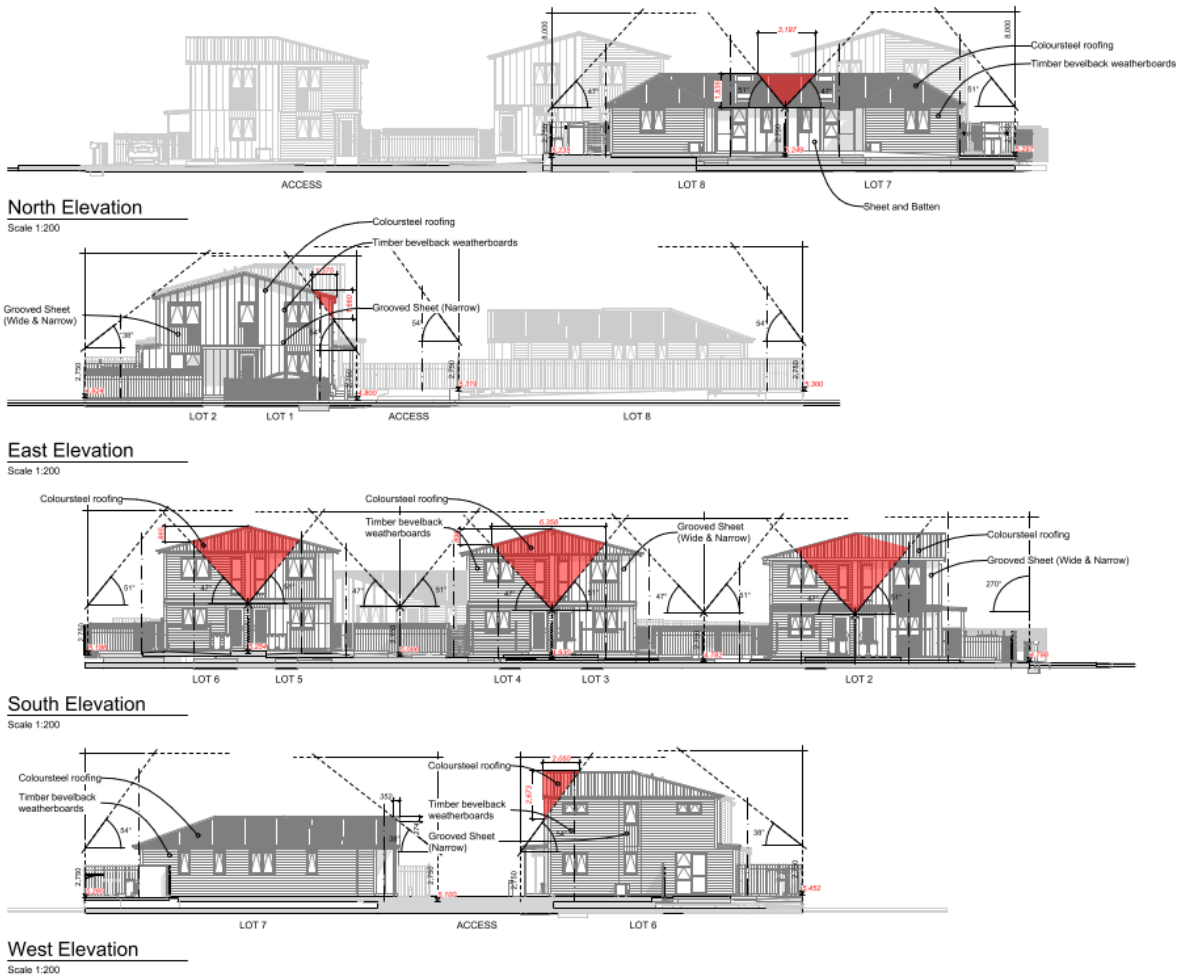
Elevations; red indicates height recession plane infringements on boundaries. Some are duplex boundaries and so not applicable. Yard infringements not shown.
